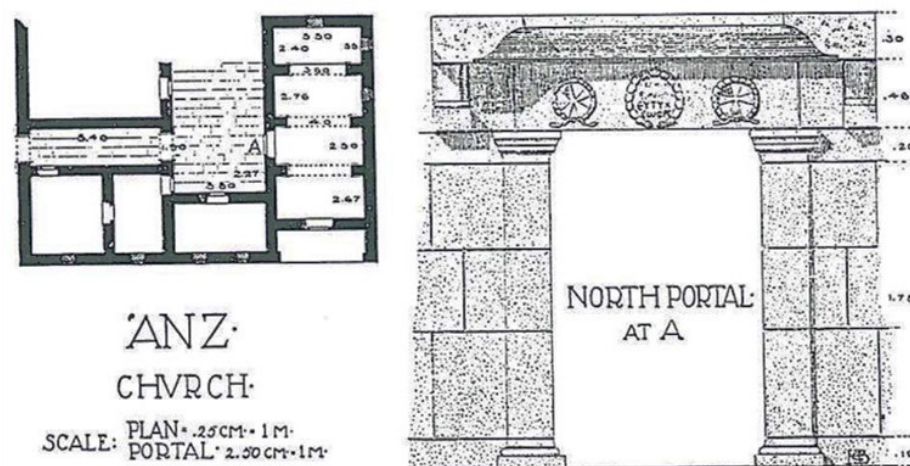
‘Anz Church plan and north portal, (Butler, 1913, p. 133).
